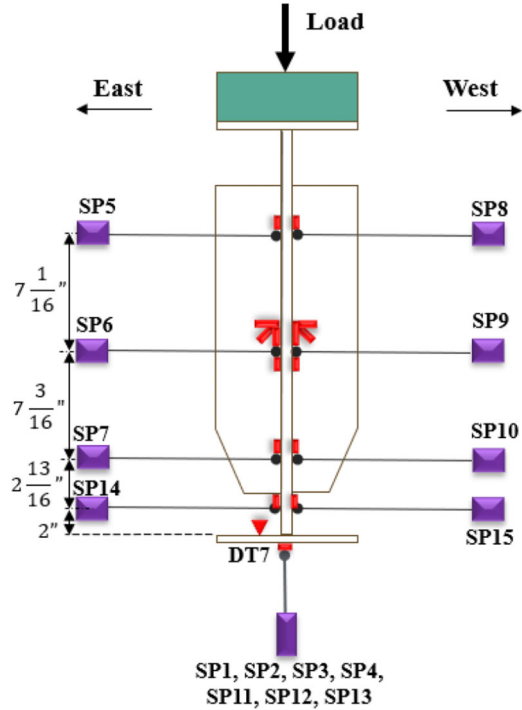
Displacement sensor layout (front elevation): Specimens 1–6.
